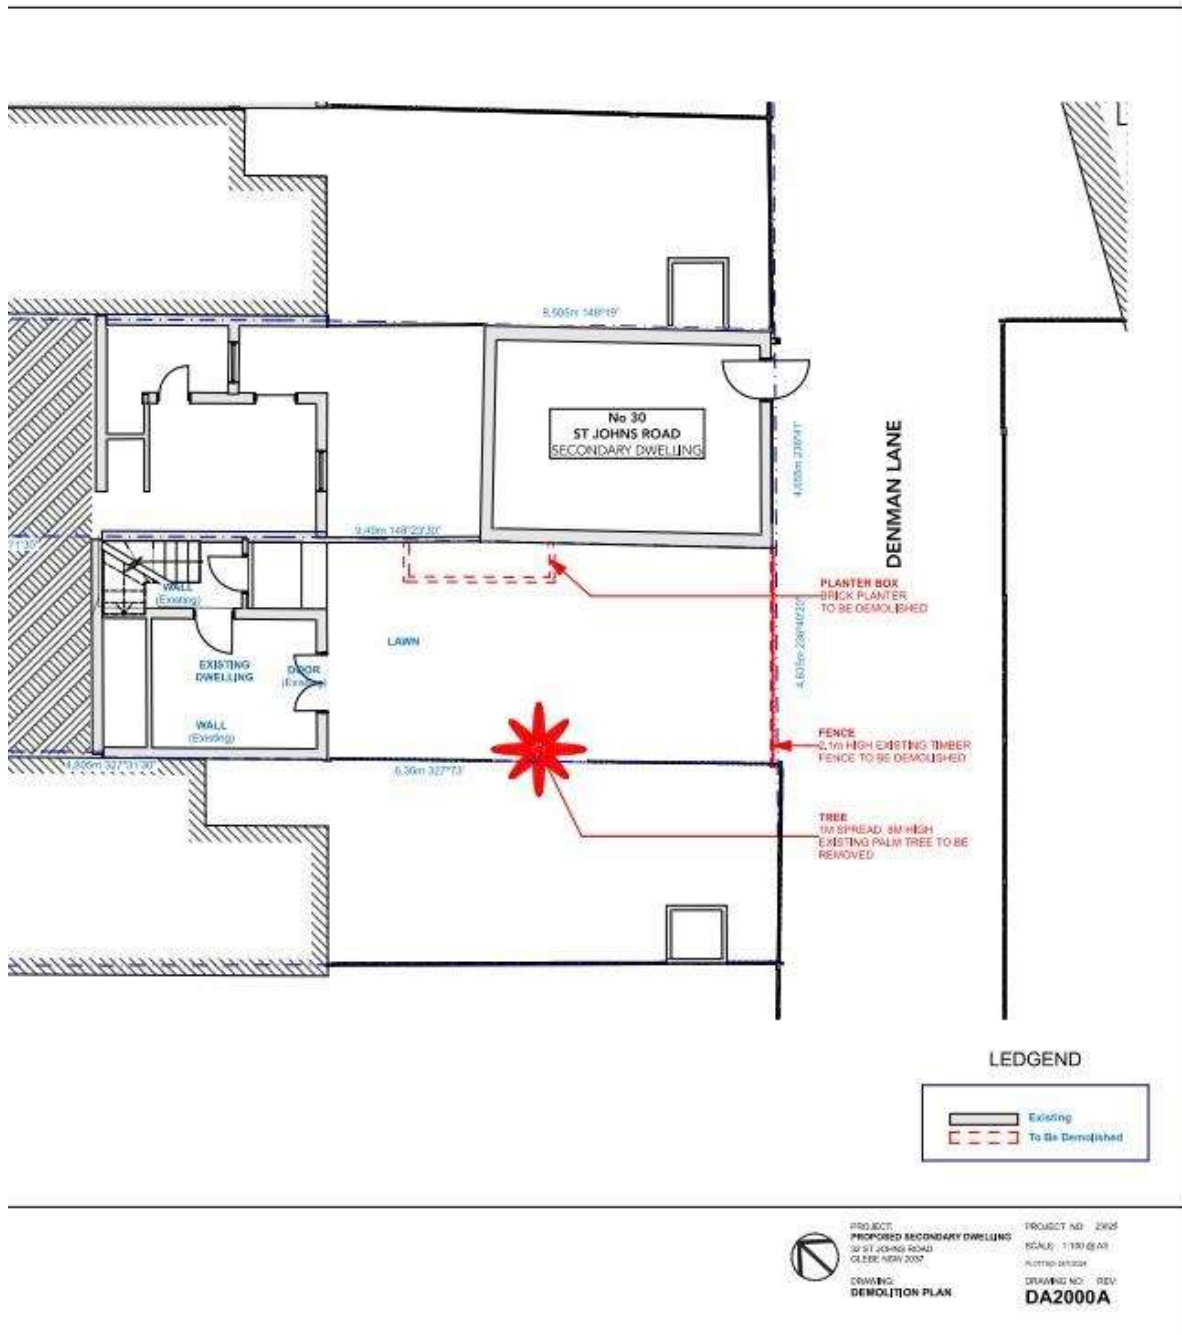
Detail of the Demolition Plan from the application. The plan shows the outhouse at number 28 and number 34 but not the one at number 32
